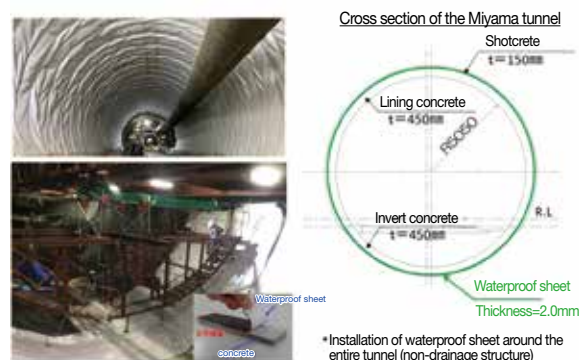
Waterproof sheet and circular cross section (watertight tunnel)
